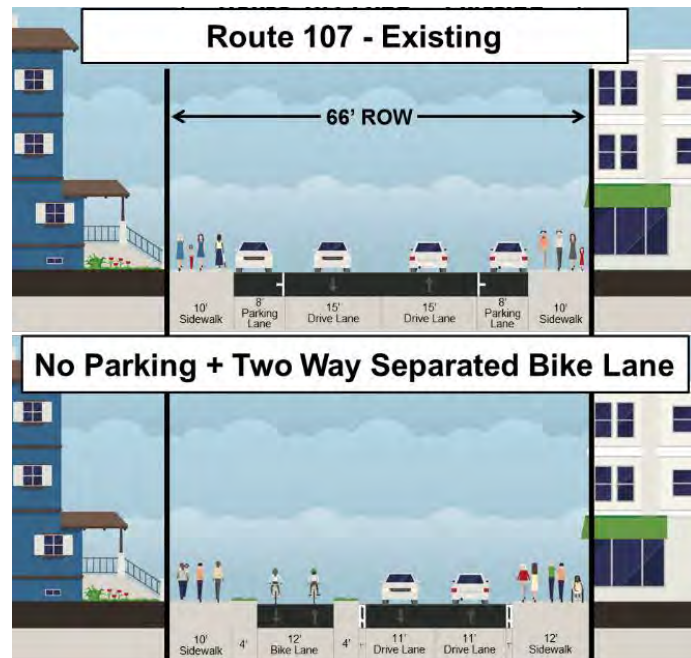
Potential Cross-Section – No Parking + Two Way Separated Bike lane
